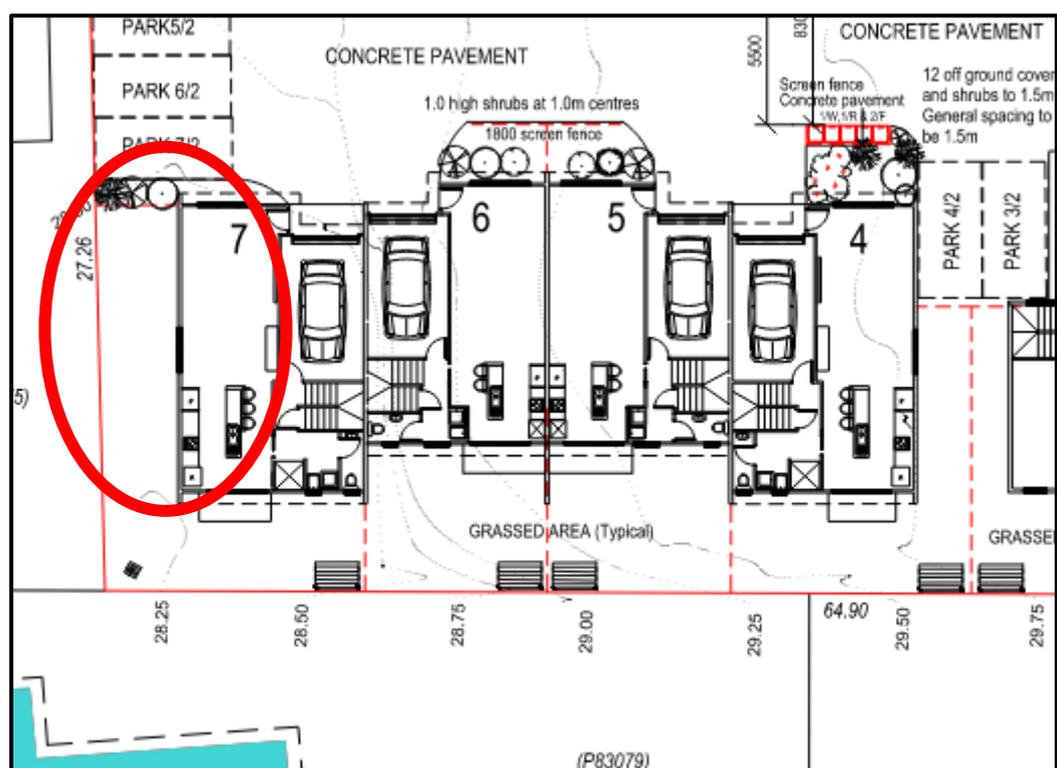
Unit 7 site plan for 21 Coleman Street, Moonah.
